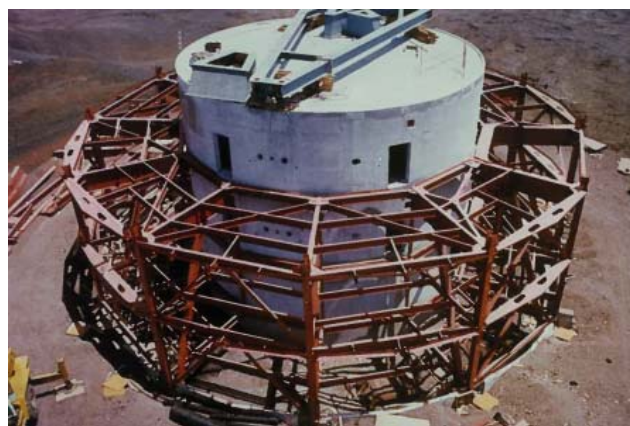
CFHT Pier building during the dome support construction (CFHT).
